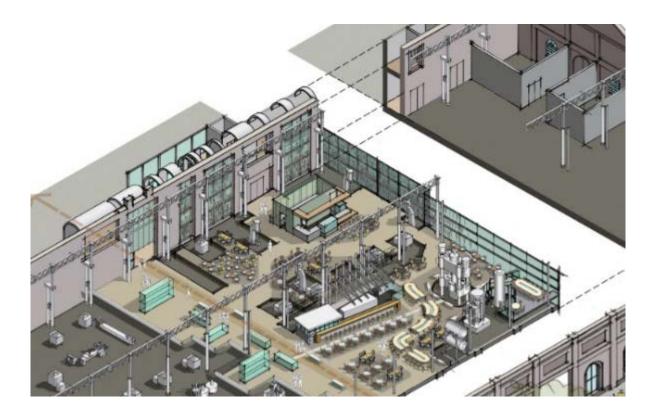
3D model extract to show the loading dock wall concept and indicative fit out of Mezzanine and Ground Floor levels
